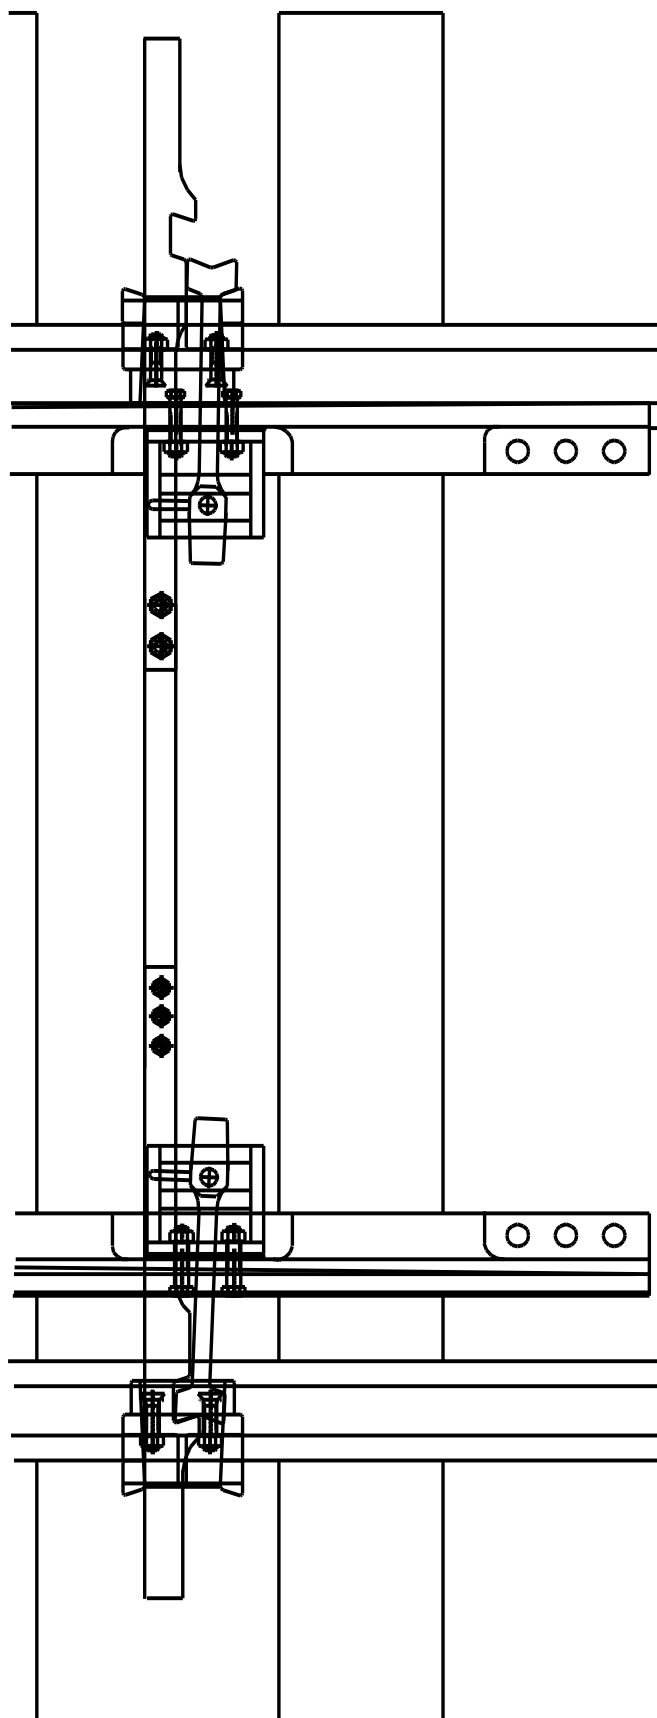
Claw Lock Assembly on a Conventional Turnout
